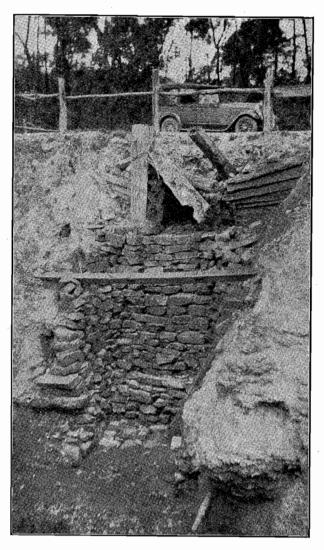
Calder Highway, Section 1, near Elphinstone. Scour caused by side drainage.
